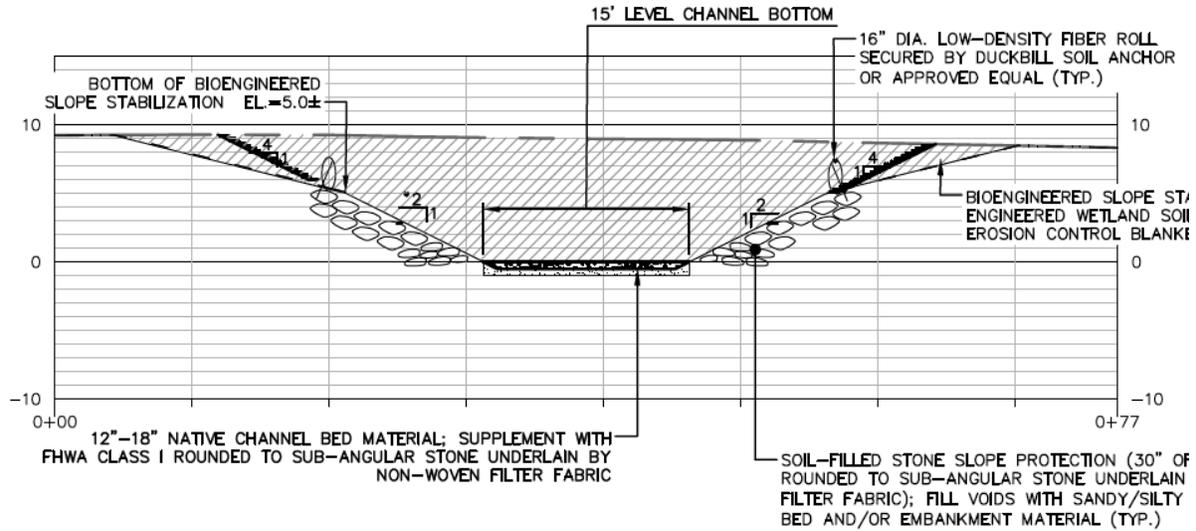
Alternative 3: 15-foot width open channel breach with no roadway overtop.
